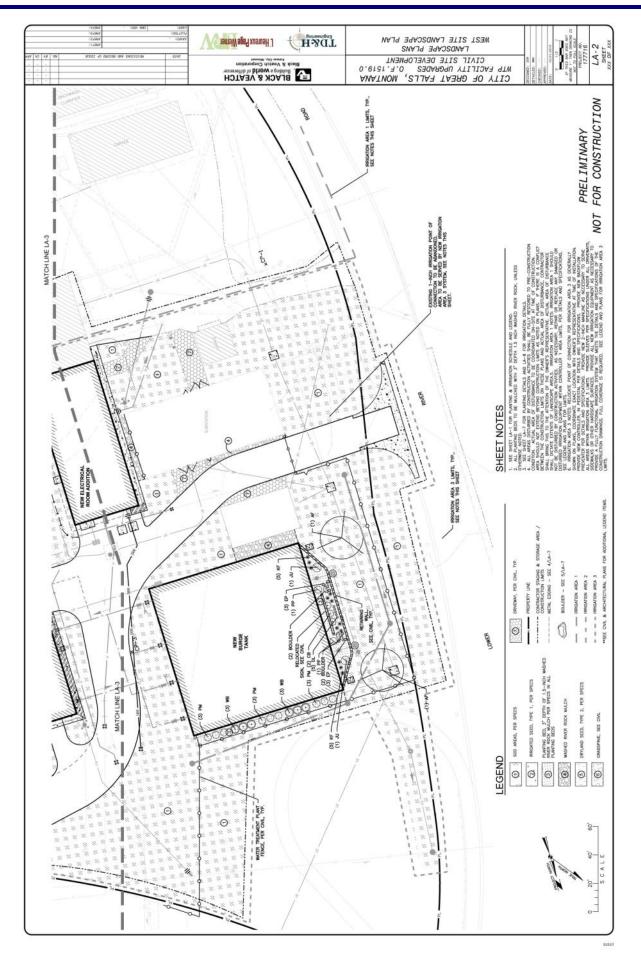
EXHIBIT G-LANDSCAPE PLAN (SOUTH)
